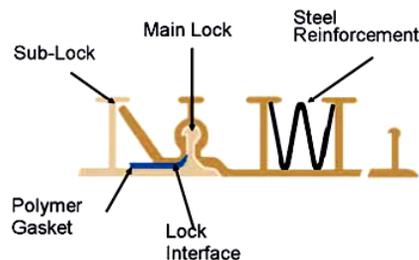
A PVC profile with steel reinforcement (Doherty, 2006)
